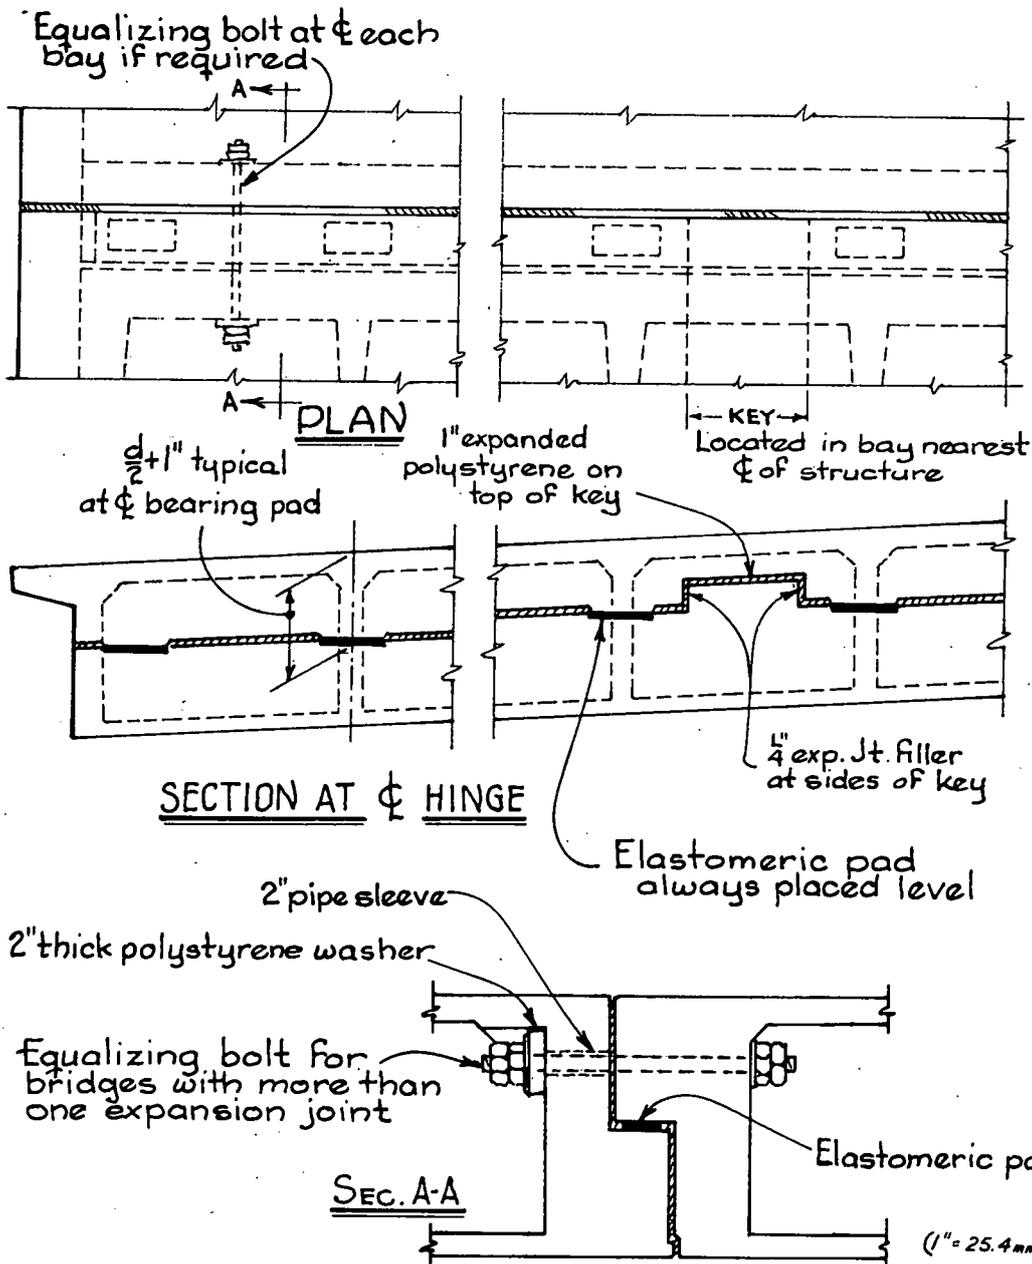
Elastomeric-pad expansion detail for concrete box girder.
